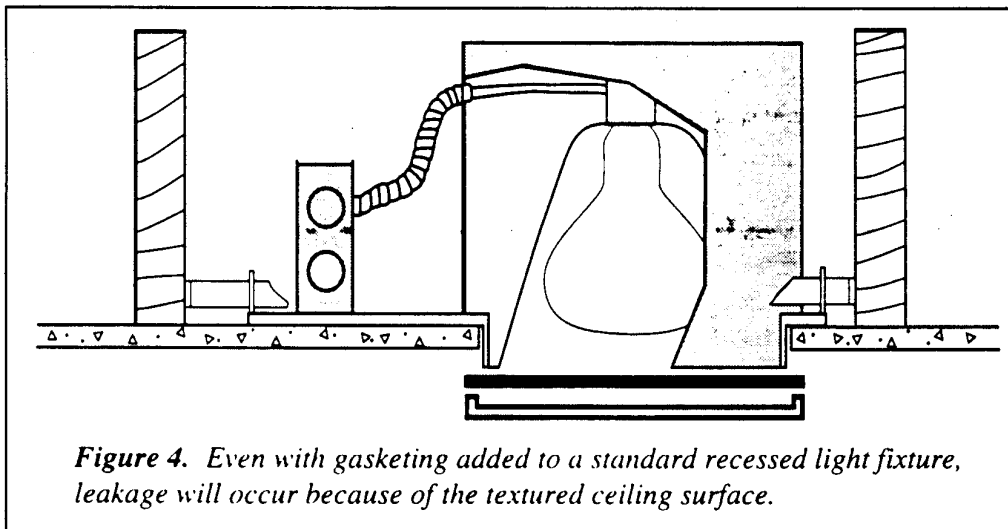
Even with gasketing added to a standard recessed light fixture, leakage will occur because of the textured ceiling surface.
